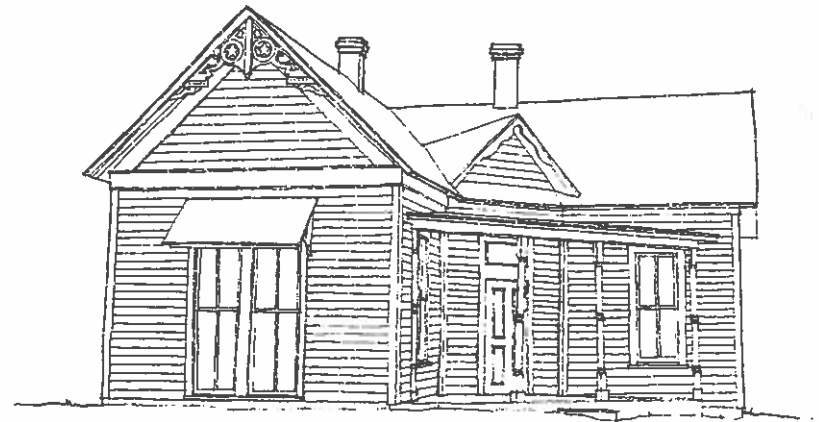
The L-Plan. After rehabilitation, this house has a new roof in earth-tone composition shingles, wood siding, rebuilt chimney, and meter boxes have been moved to the side.
